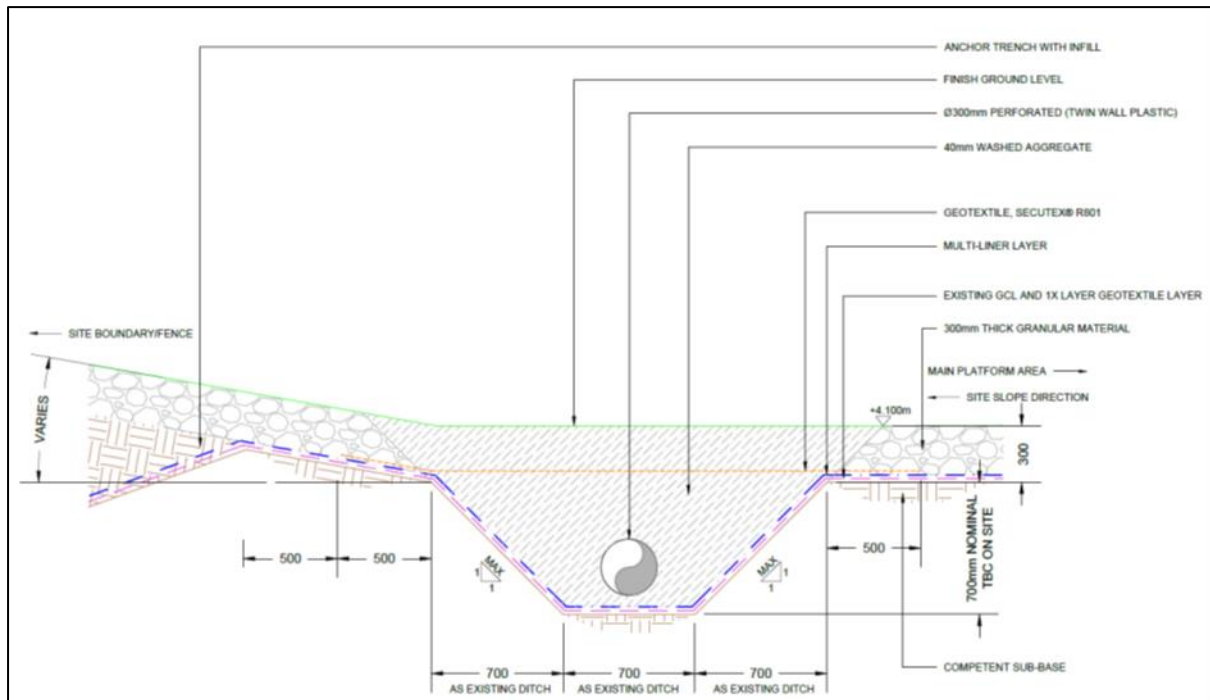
Typical detail through perimeter drainage system (French Drain)
